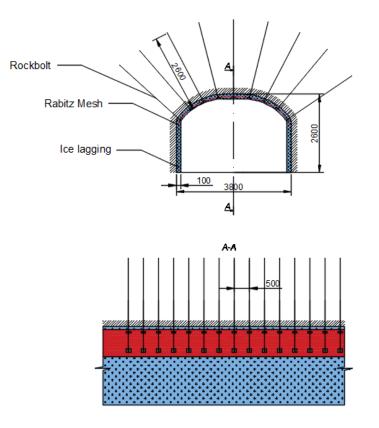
The scheme of the passport of support setting with rockbolts in underground mine workings of the tourist complex.
